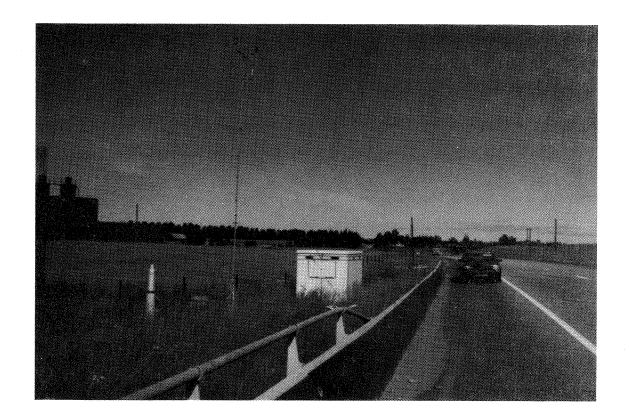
Fifty meter section with 70 cm high roadshoulder barriere.
